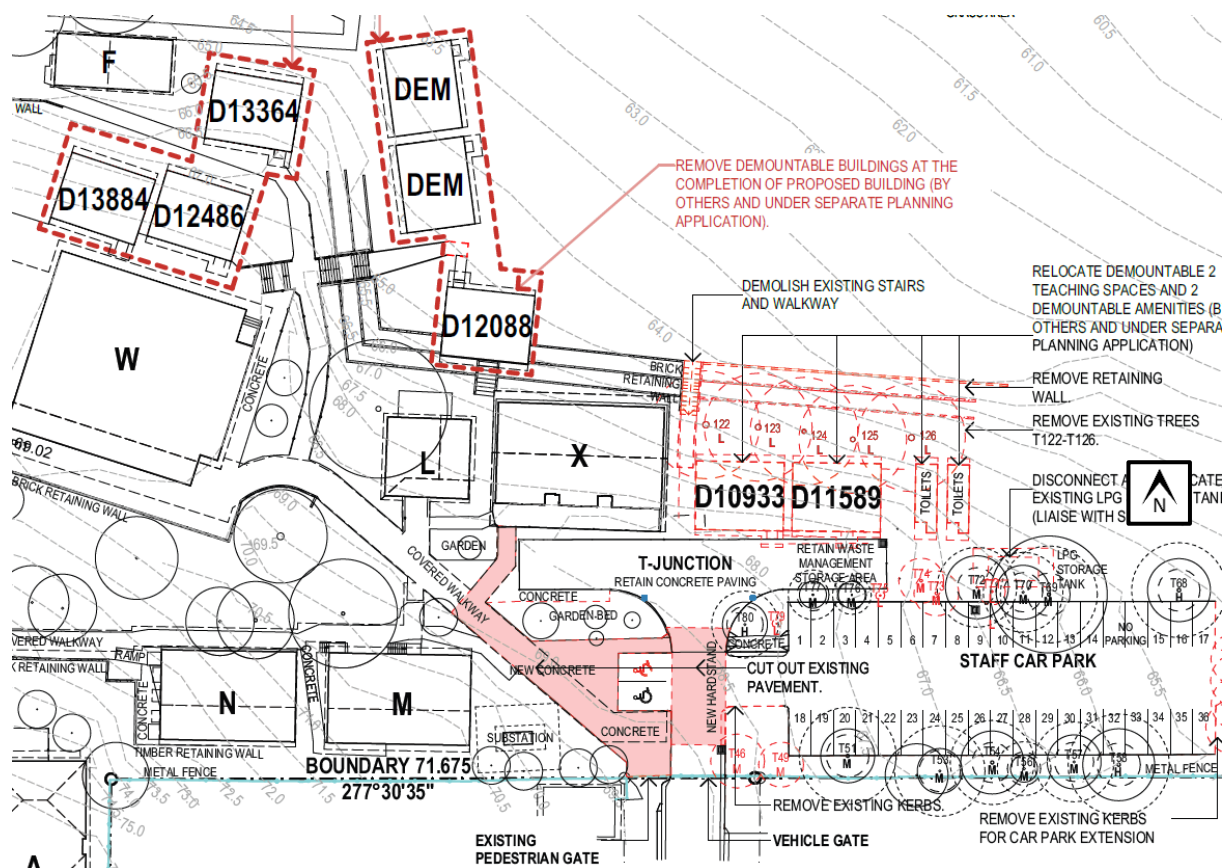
Existing Site Plan prepared by Fulton Trotter Architects.
